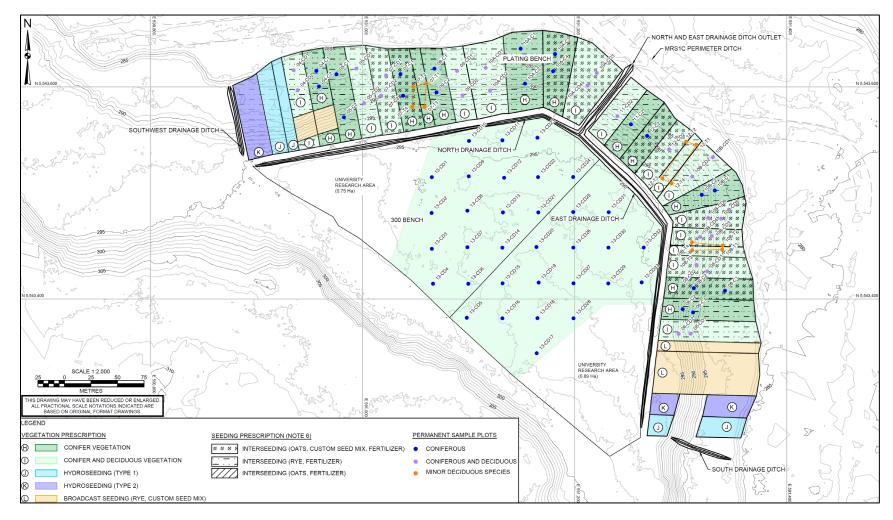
Test Cover Trial revegetation treatment as-built plan.
